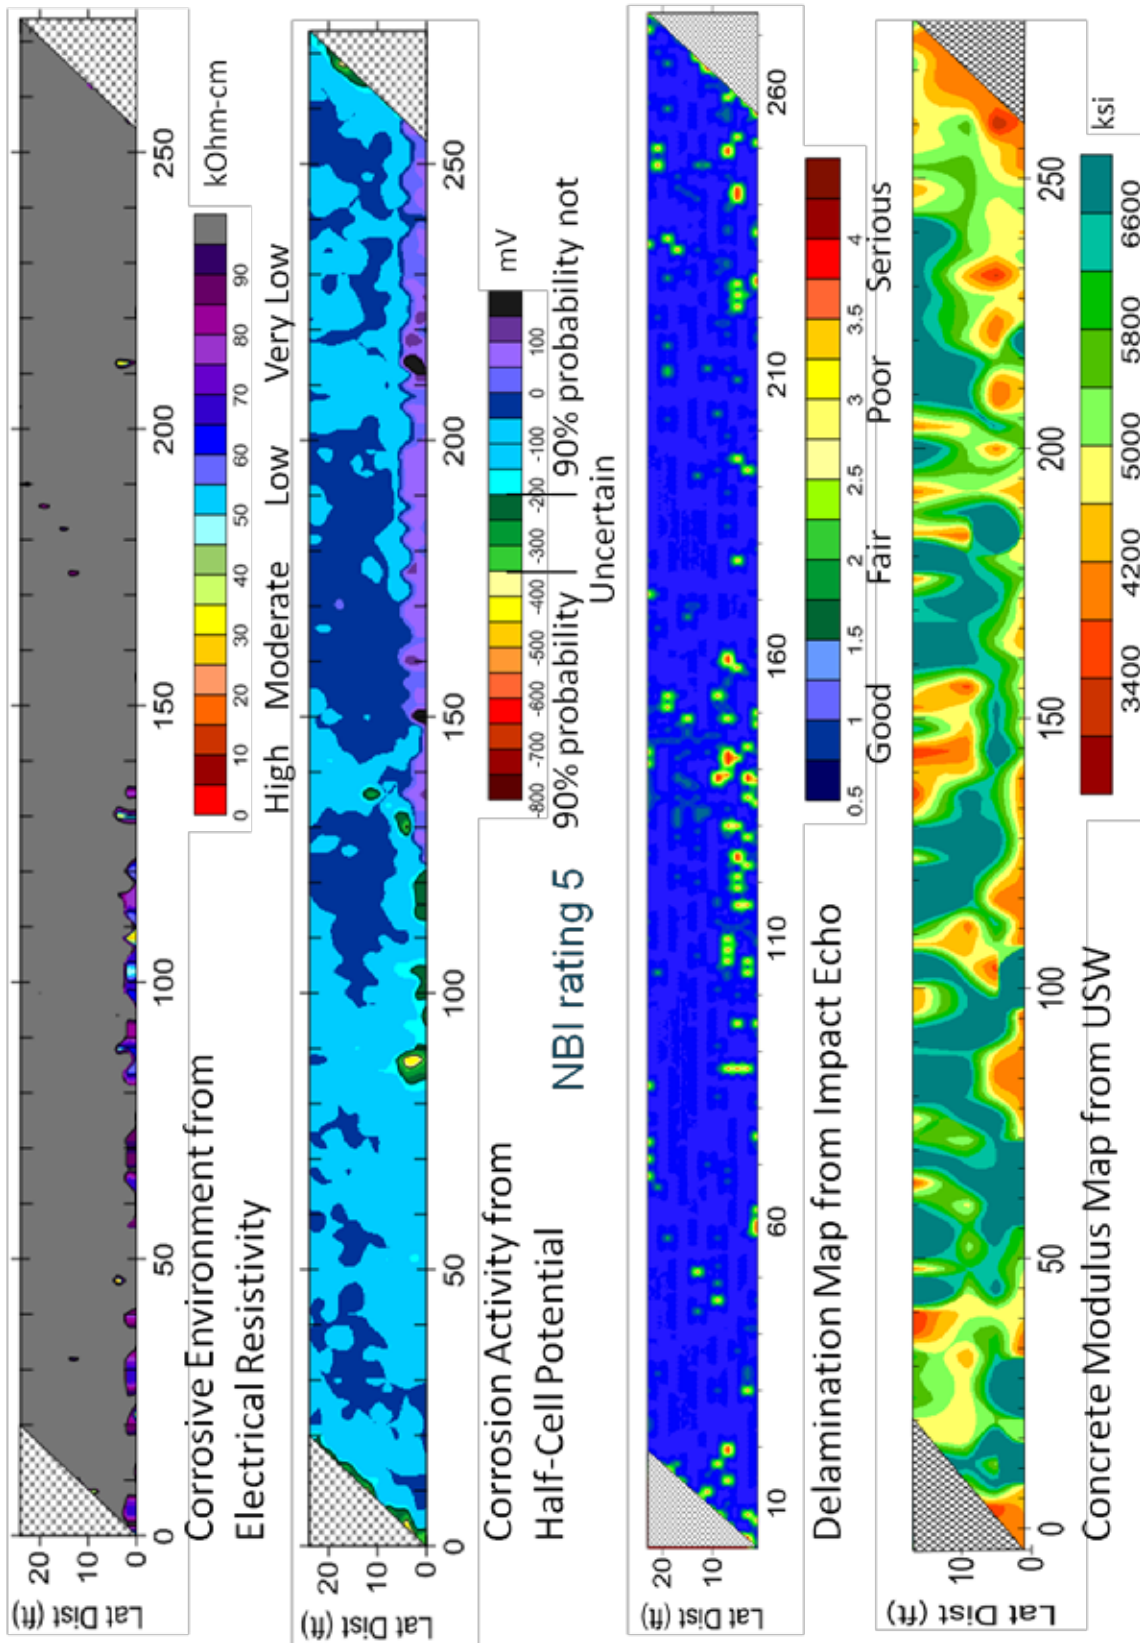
Condition maps for Creek Road over I-295 bridge deck.
